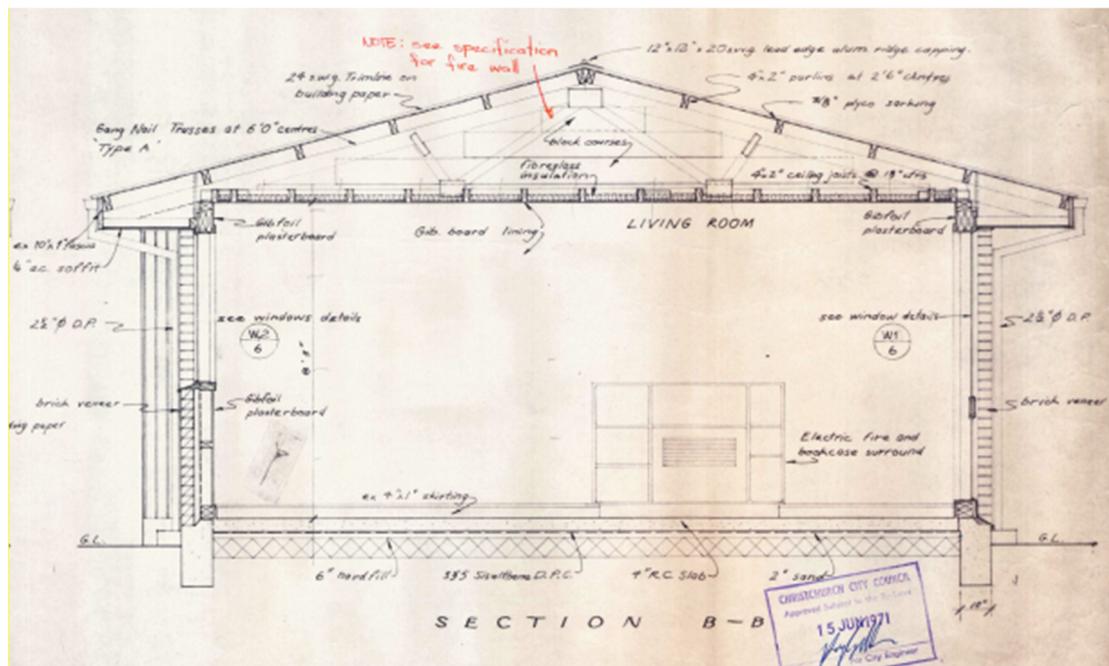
Typical cross section of a residential unit (from Harold Denton Housing Complex).
